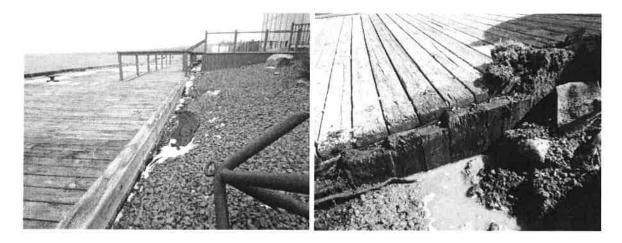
Settlement of backfill on inshore side of bulkhead and image of timber bulkhead members exposed in a test pit. Note the elevated water level.
